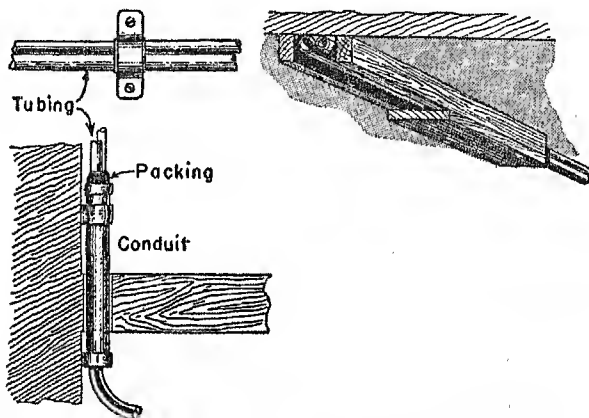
Methods of Protecting Refrigerant Tubing Lines.
